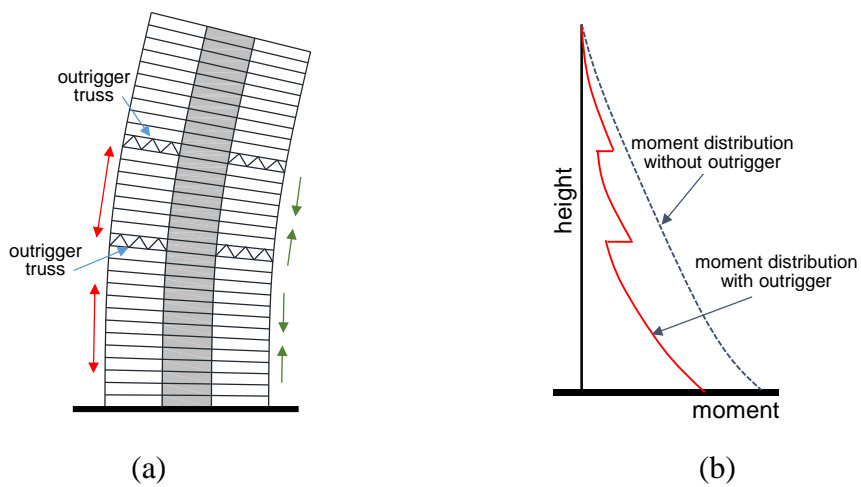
The (a) elevation of building with two layers of outrigger, and (b) illustration of core structure moment distribution with and without outrigger
